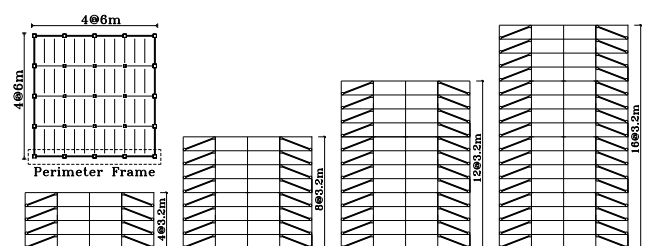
Plan and elevation of the designed perimeter RC braced buildings
